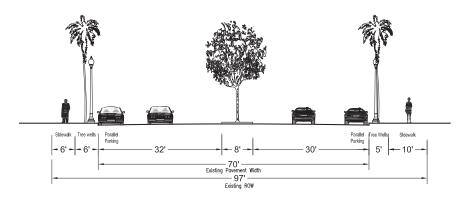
TYPICAL SECTION - SIERRA AVENUE
